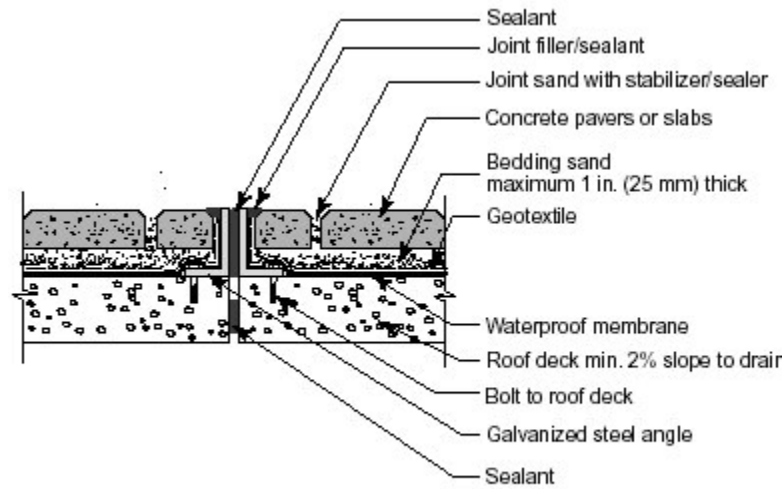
Edge restraint detail at a roof construction joint for pedestrian roof applications (14)
